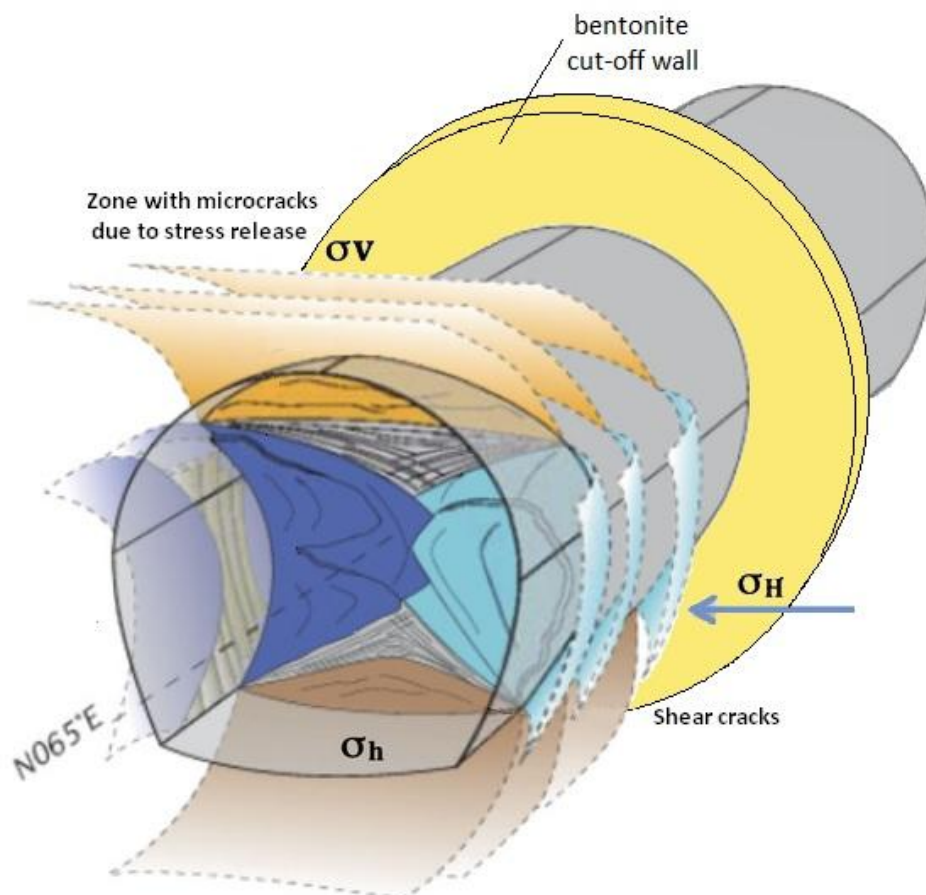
Depiction of EDZ and bentonite cut-off wall. Adapted from Zaoui, A. & Sekkal, W. (2014)
